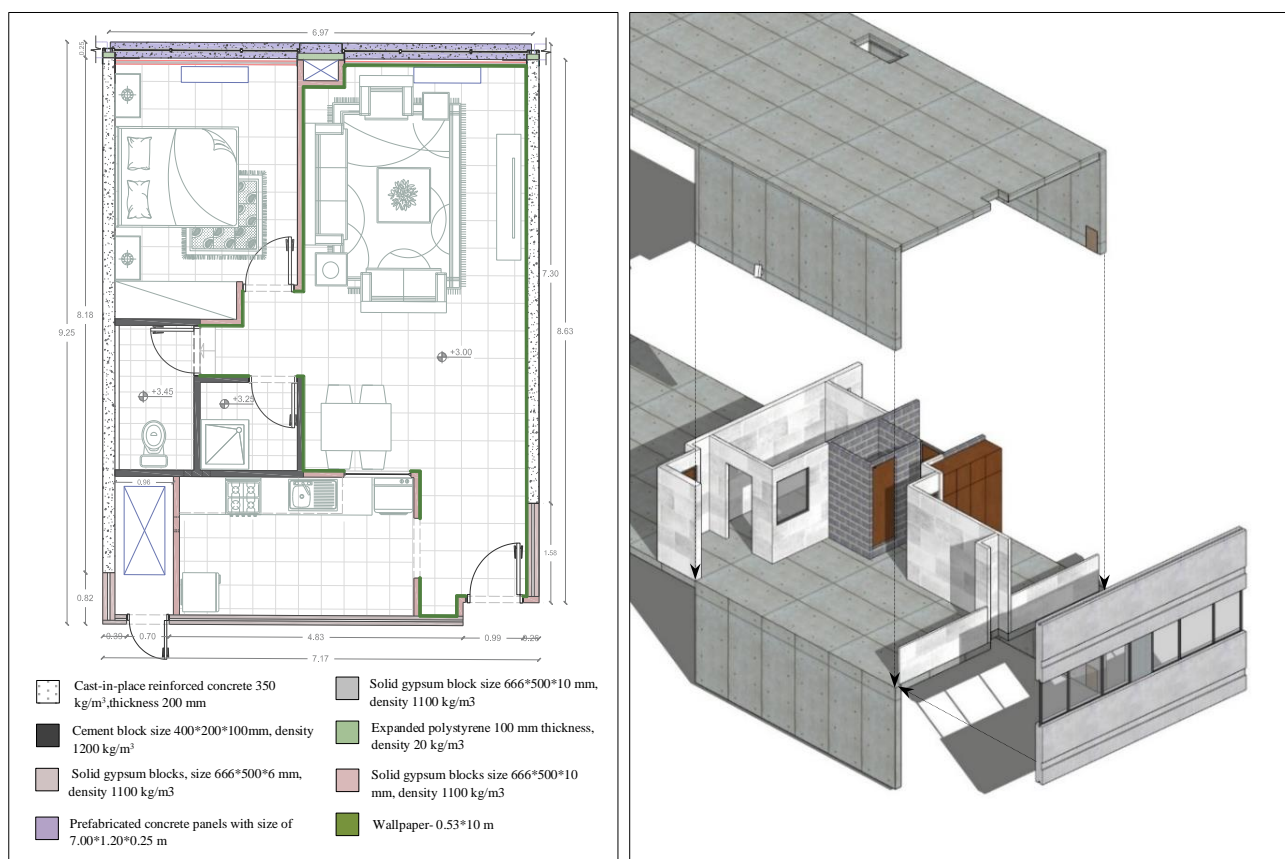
Architectural plan of scenario 1 (left); Isometric of scenario 1 (right). Source: Author
